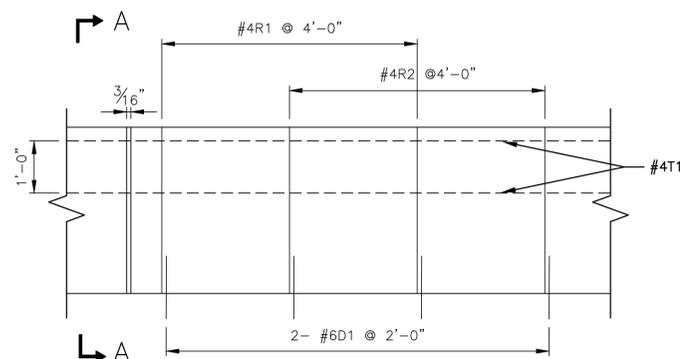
DETAIL OF OPENINGS TO BE CONSTRUCTED IN BARRIER CURB
